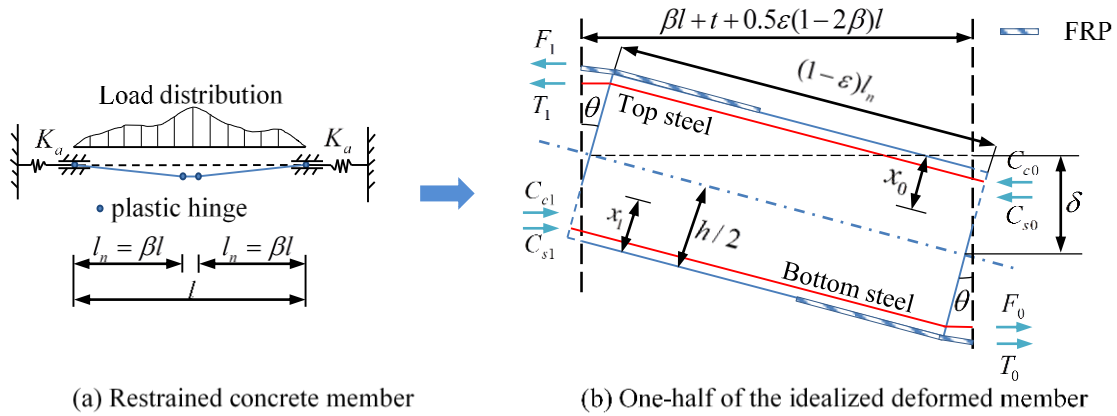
Schematic view of a restrained concrete member and one-half of its deformed shape
